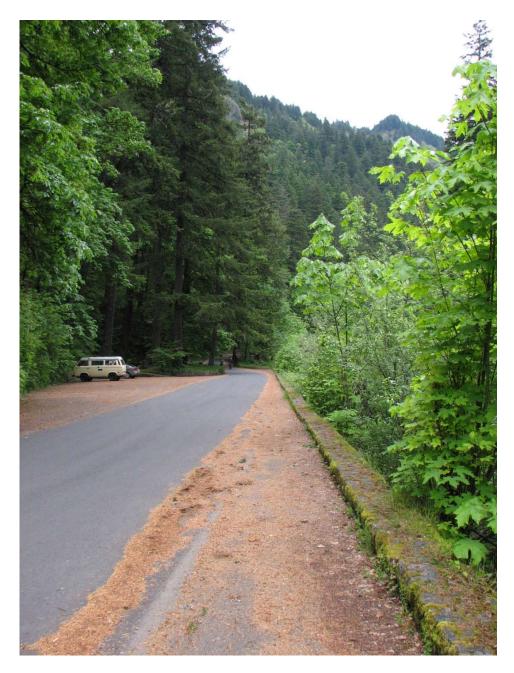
Lower area, road along Eagle Creek. Historic rock retaining wall, looking toward Eagle Creek Trail.
